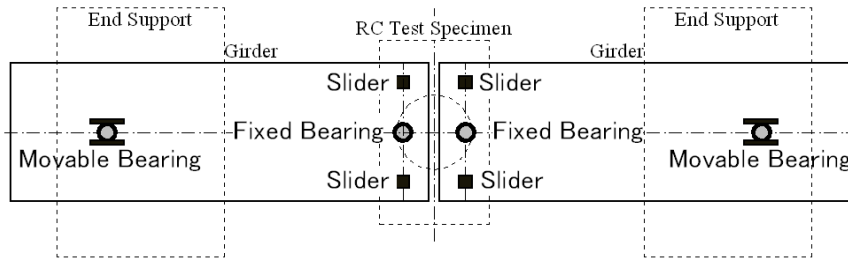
Supporting condition of two girders on the column specimen and two end supports.
